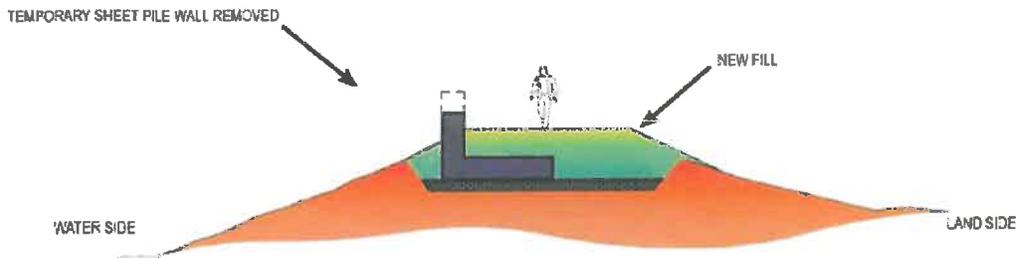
Typical Conventional Floodwall Levee Improvement Type
